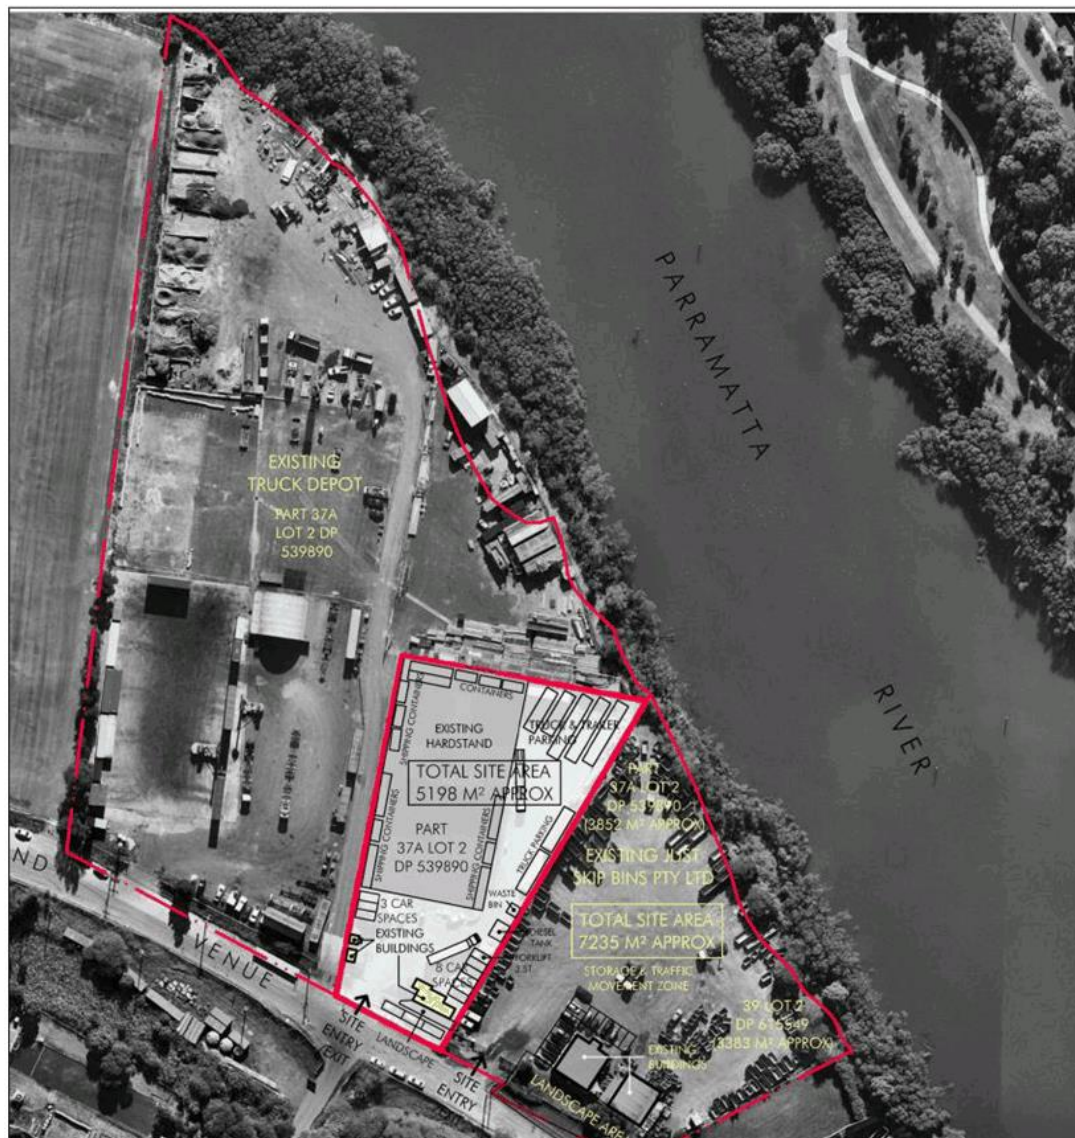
Site Plan showing section of the Site operated by Streamline Container Services (Source: Nettletontribe, 2021)
